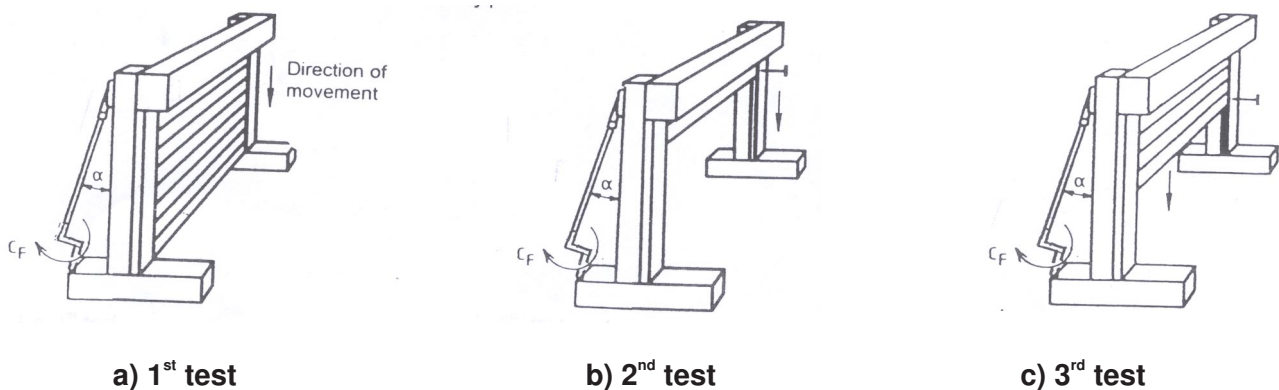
Operation by gear with crank handle - Forced operation during extension - For roller shutter
